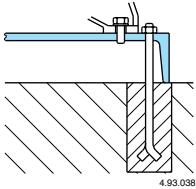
Foundation for unit mounted on single-piece, channel-steel baseplate.
